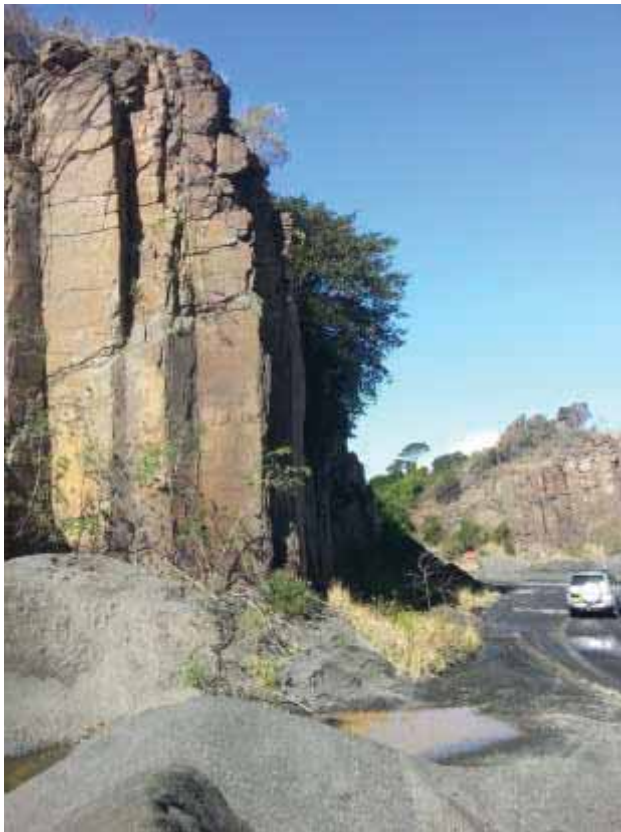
The proposed blending plant site immediately adjacent to the 16 m high rock face.
